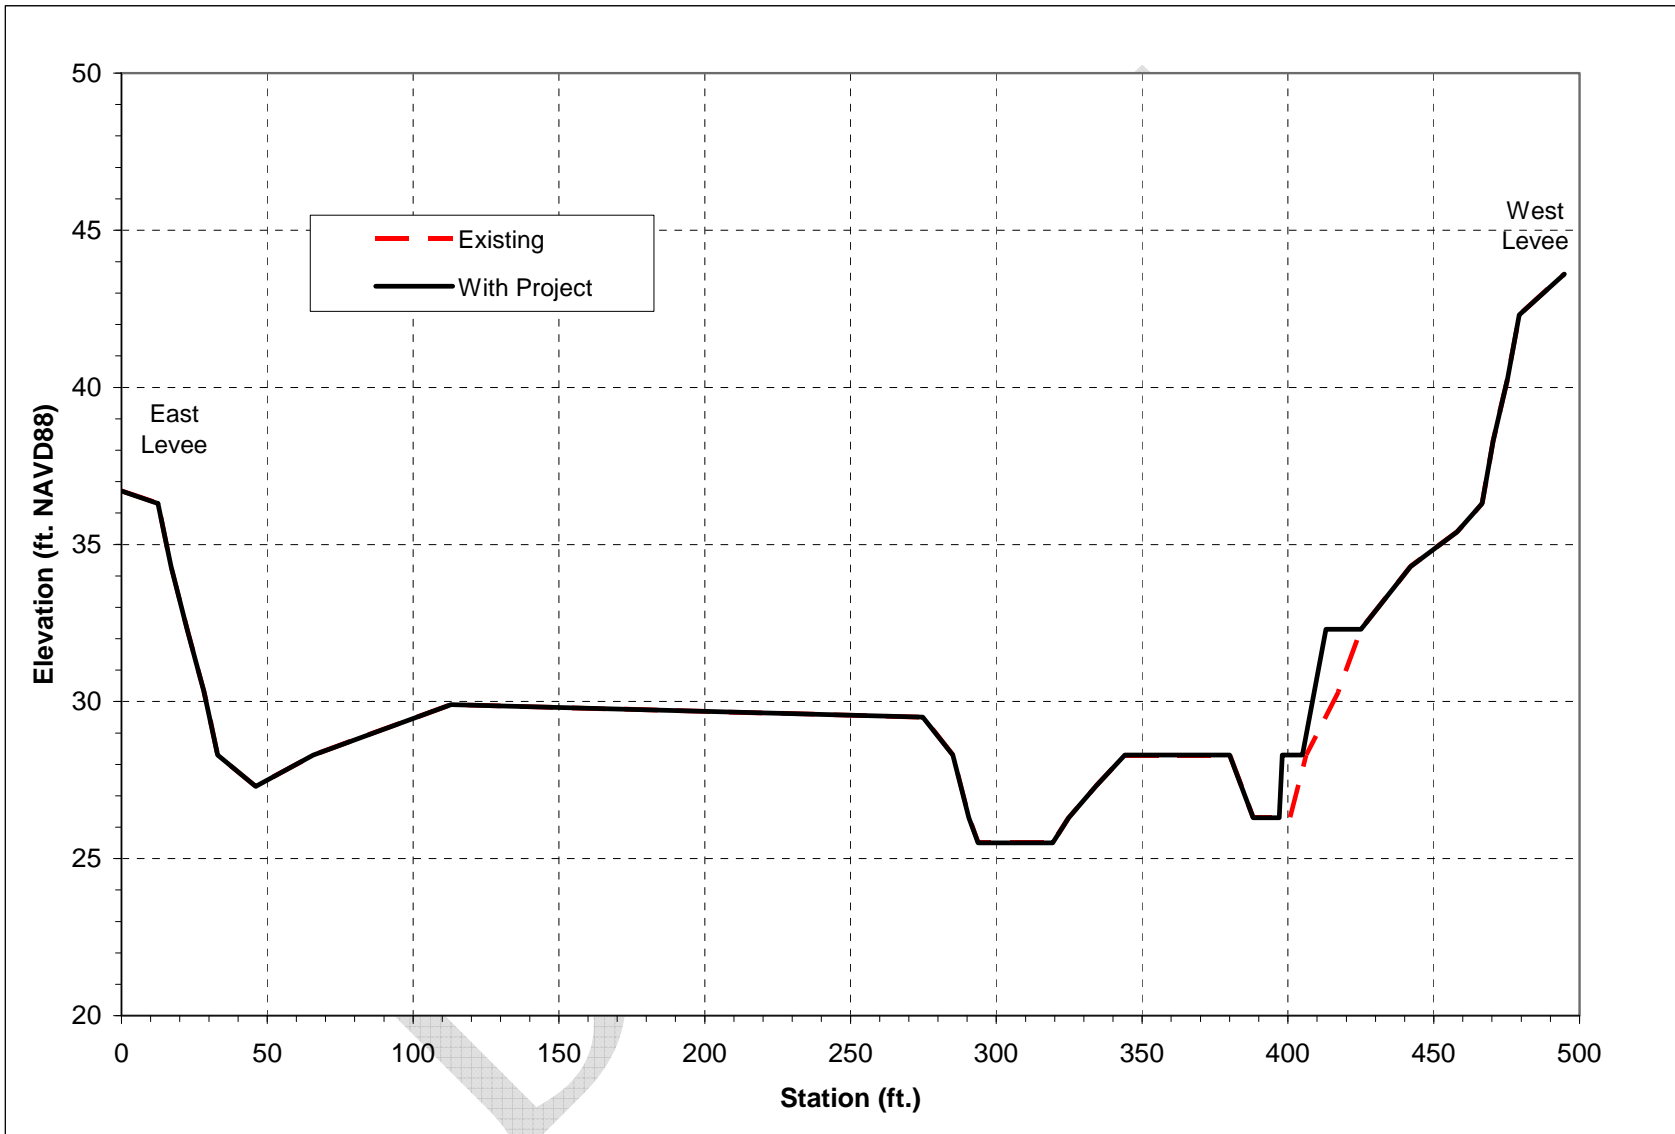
Rock Erosion Protection Berm in Hydraulic Model at NEMDC Northern Erosion Protection Site
